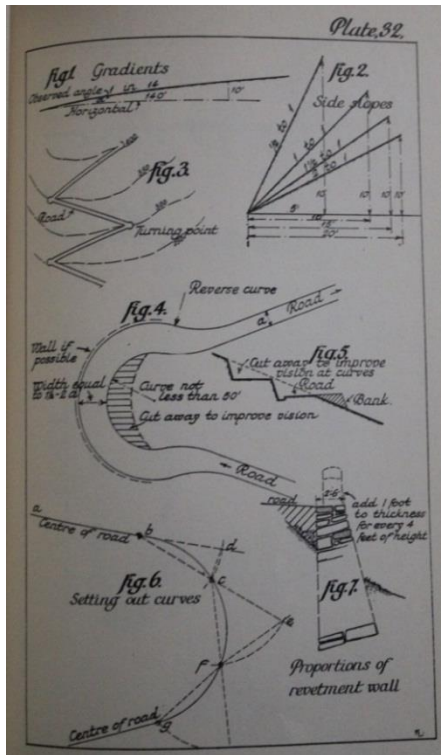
Longland's Sketches for Constructing Road Gradients, Curves and Roads on Hill-sides, Culverts, and Wood Bridges<sup>216</sup>
